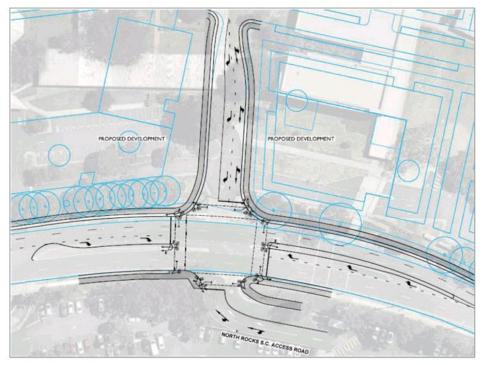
North Rocks Road signalised access point (Source: GTA Consultants)
